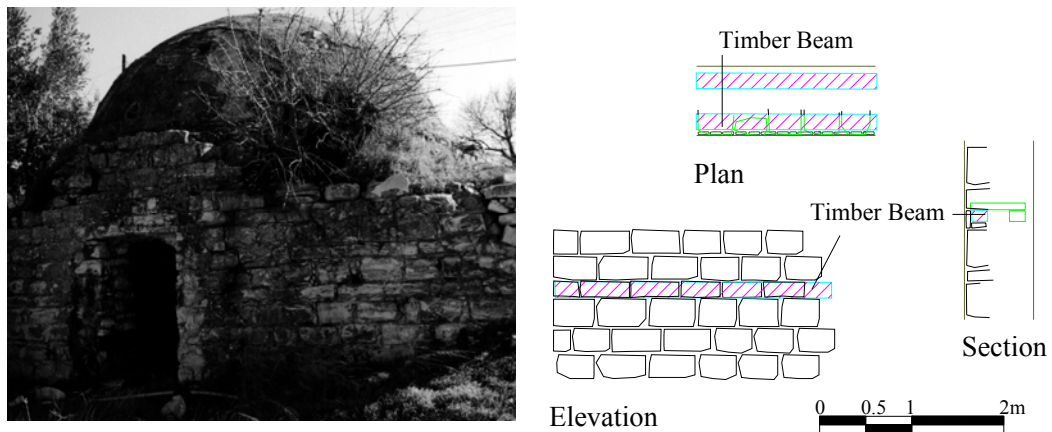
Rüstem Paşa Hamamı, North-west elevation, Rough cut stone bond
